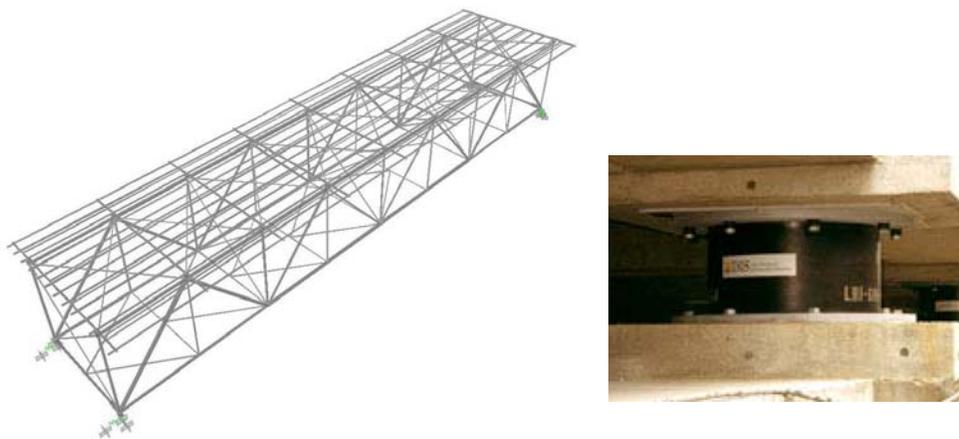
a) FE model of typical approach truss span b) typical seismic isolation bearing
